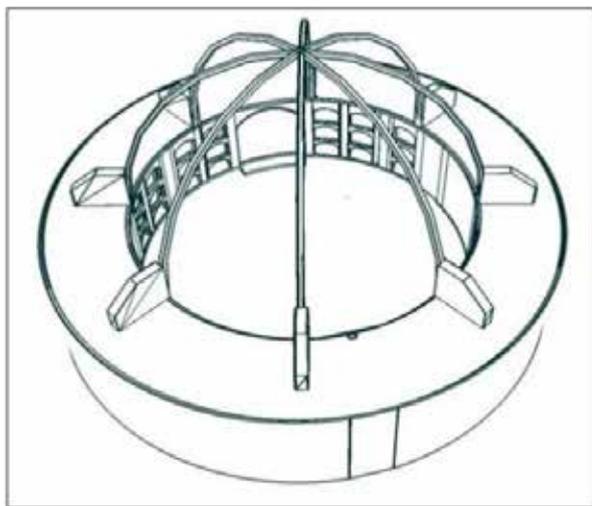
Outer area of Tekyeh Dowlat, special system for building roof. Source: authors.
